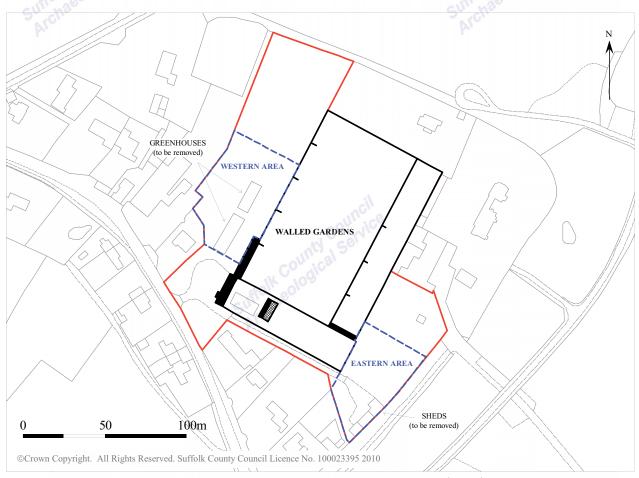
Plan showing the two proposed building areas (blue) and the walled gardens and structures that are to be retained (black)
